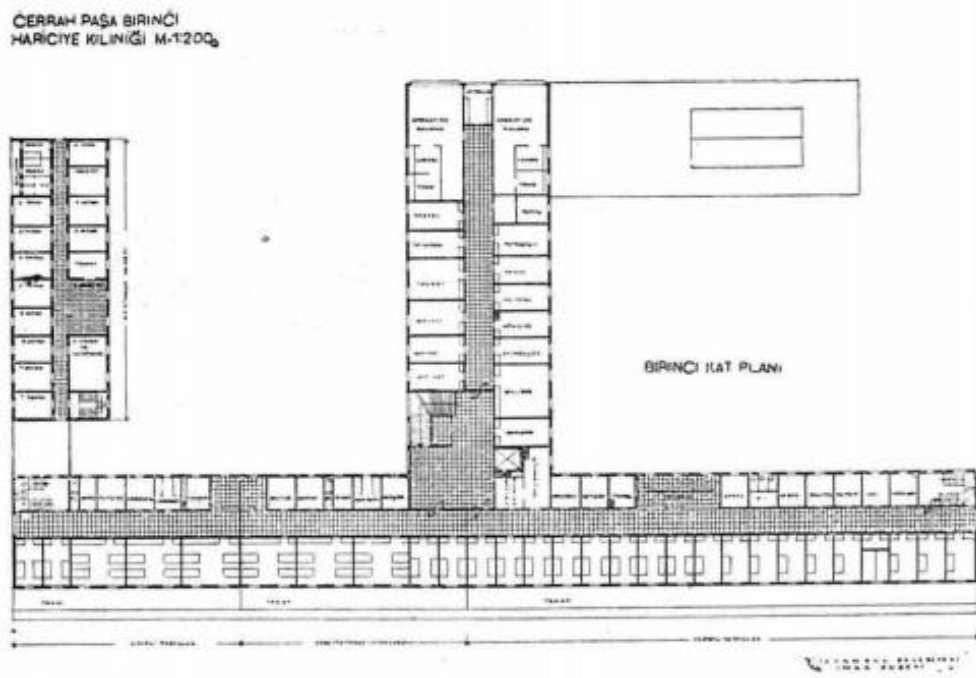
External Diseases Department, Cerrahpaşa Medical Faculty Hospital, First Floor Plan
